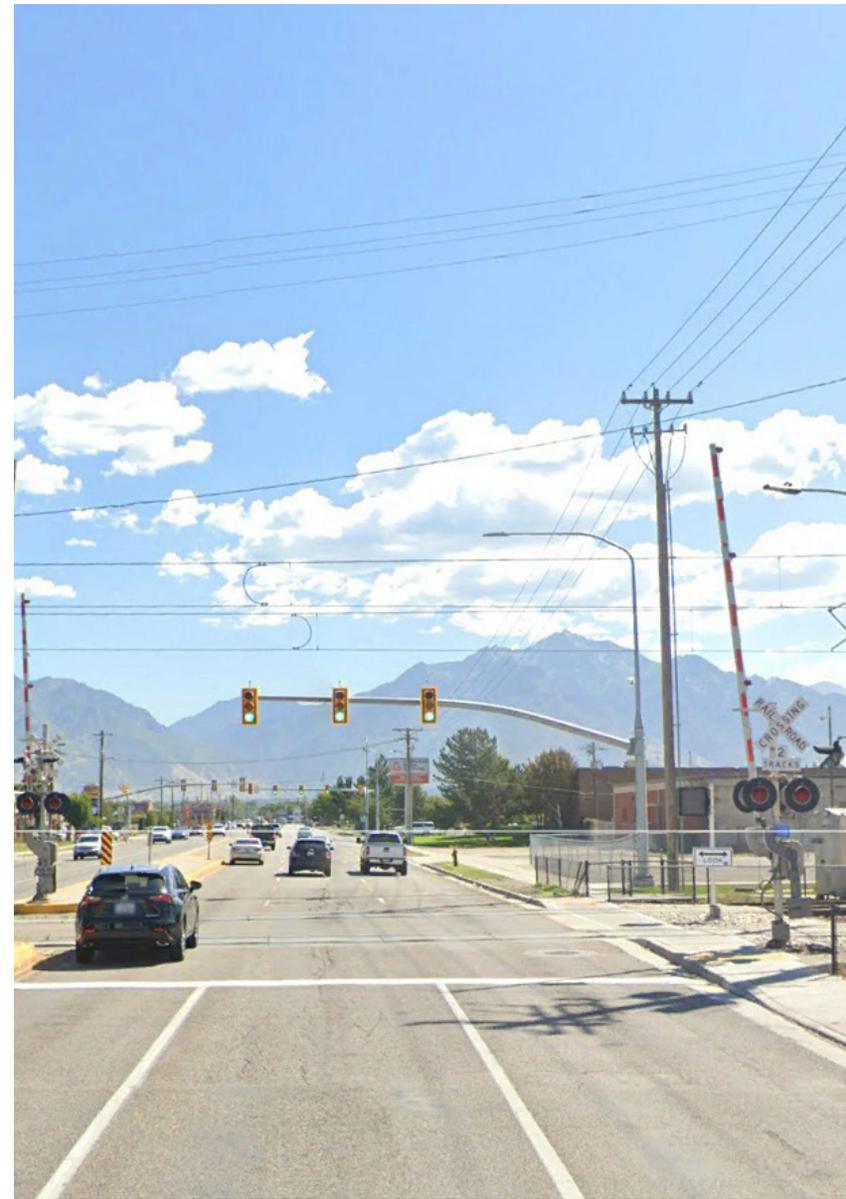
Recommended Crossing Improvement Site on 7200 South
